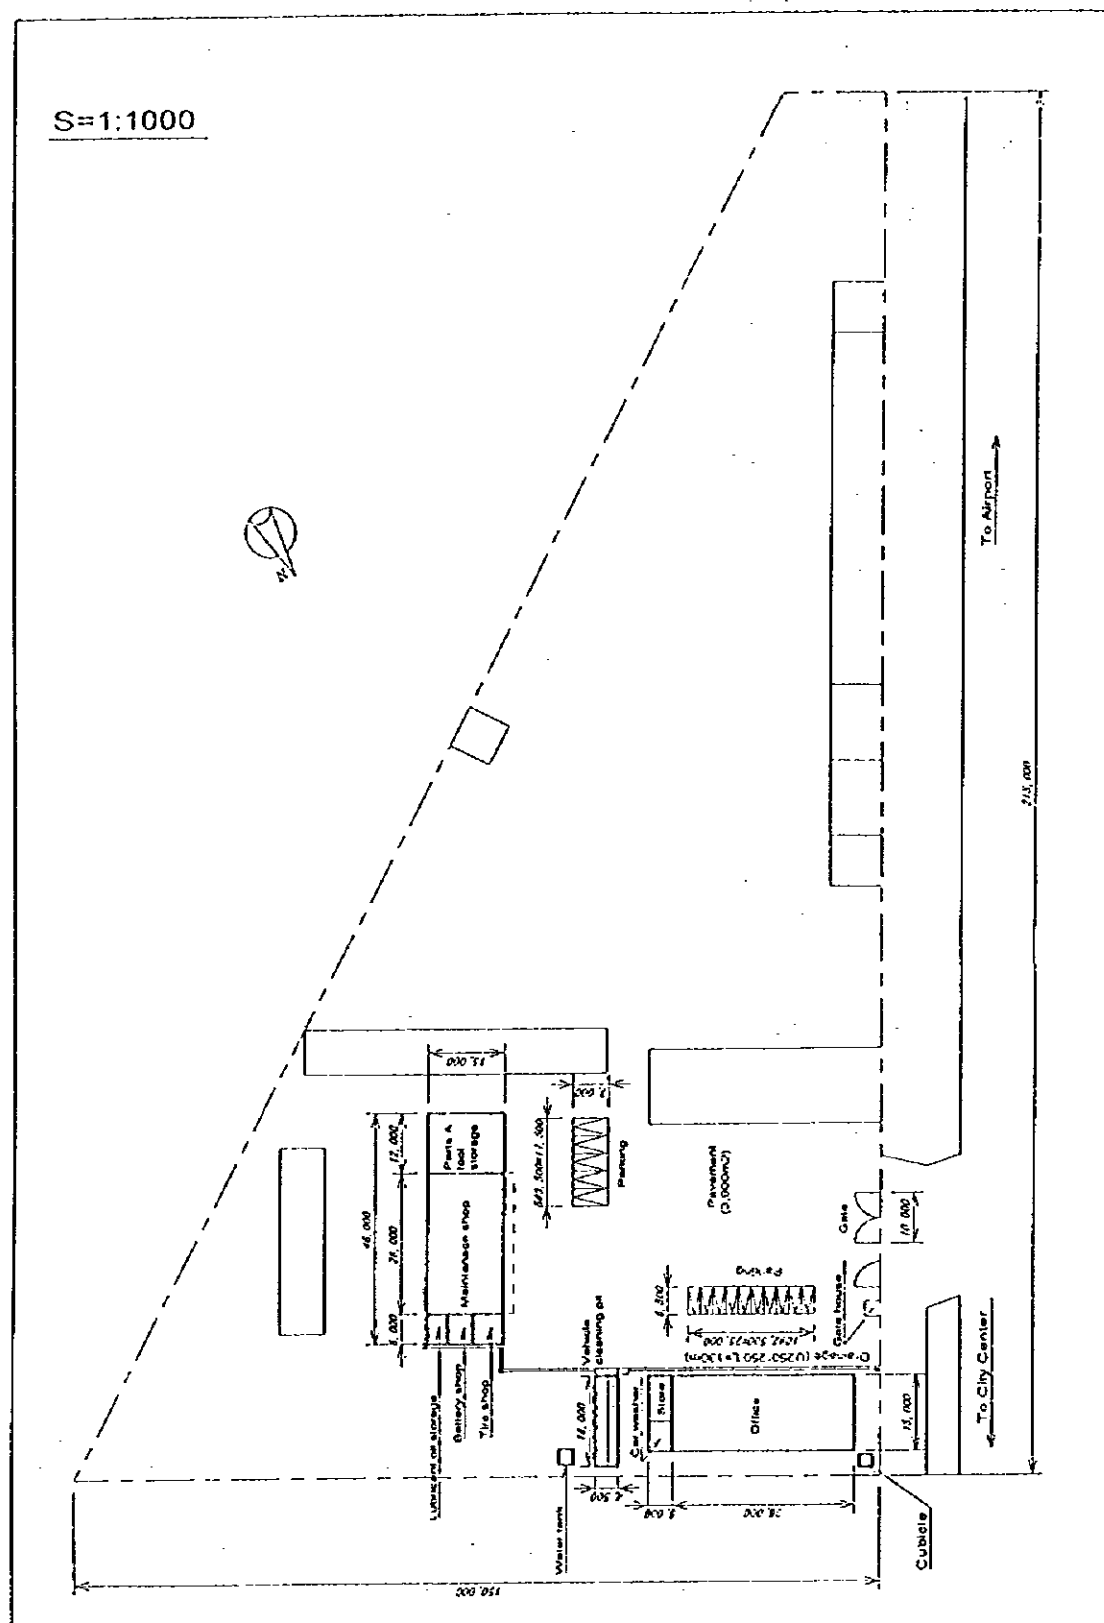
General Improvement Plan of the Nyerere Workshop
